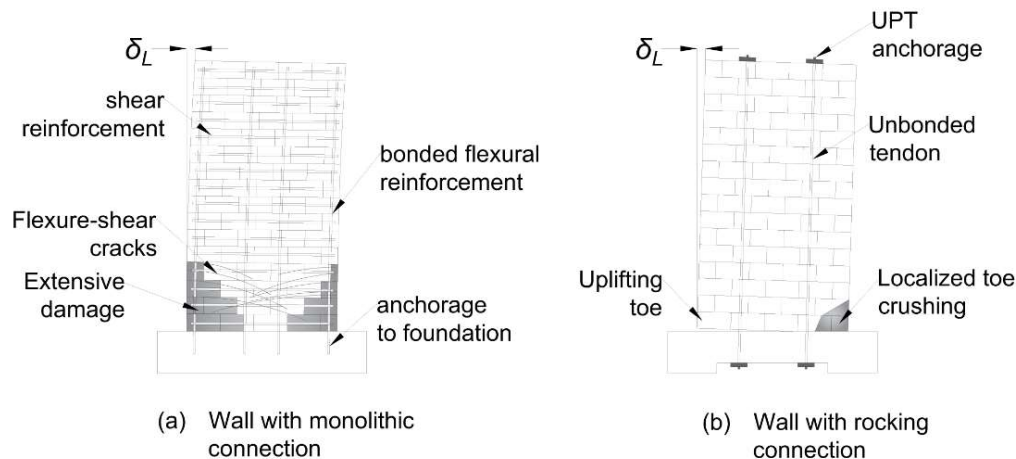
(a) Structural masonry wall with a monolithic connection to the foundation and (b) Structural masonry wall with a rocking connection to the foundation.
